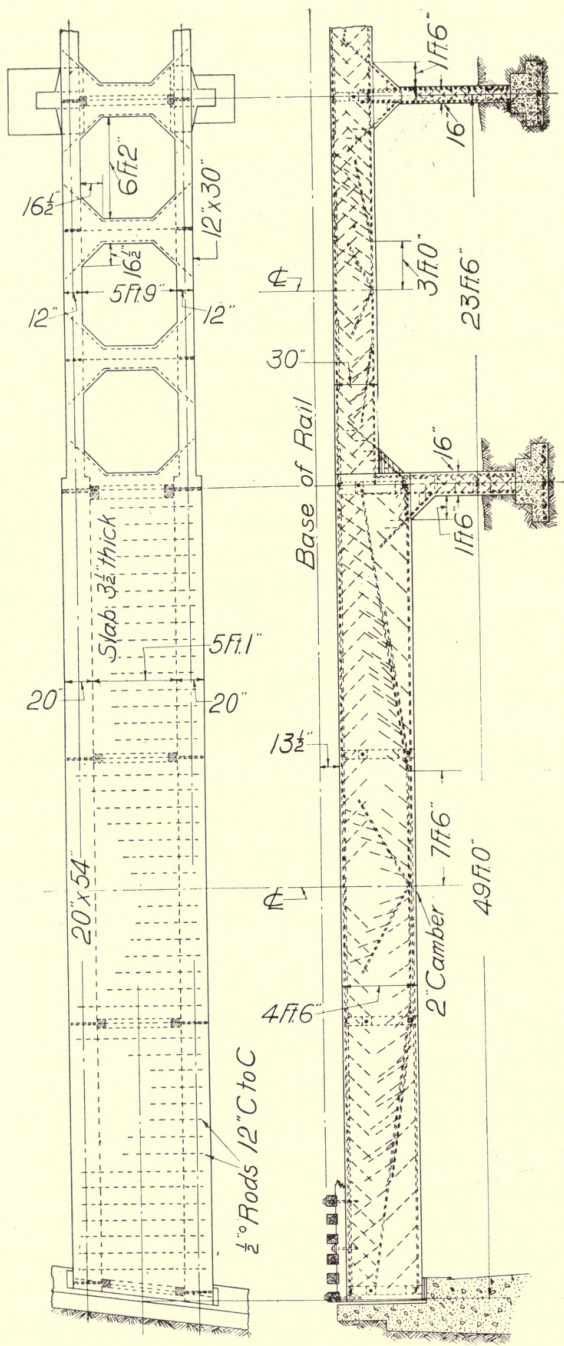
PLAN AND ELEVATION OF RICHMOND VIADUCT.
